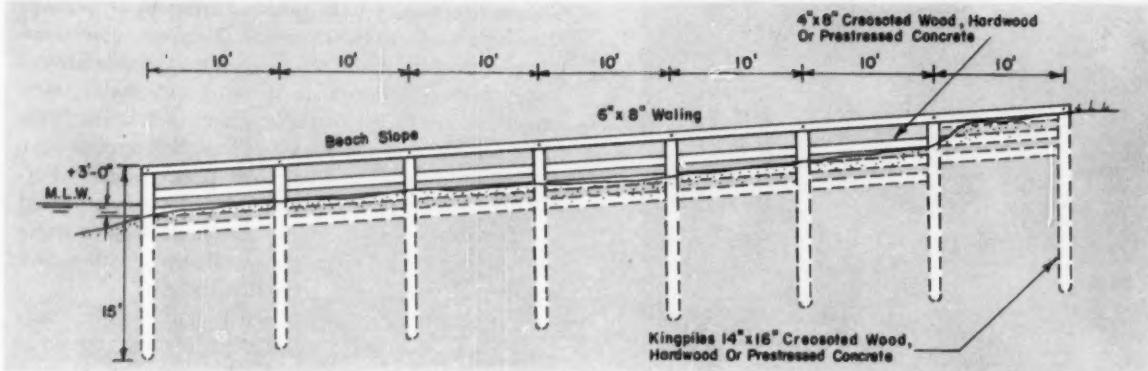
Adjustable groin, built of prestressed concrete piles. Its height must be adjusted carefully to prevent leeside erosion.
